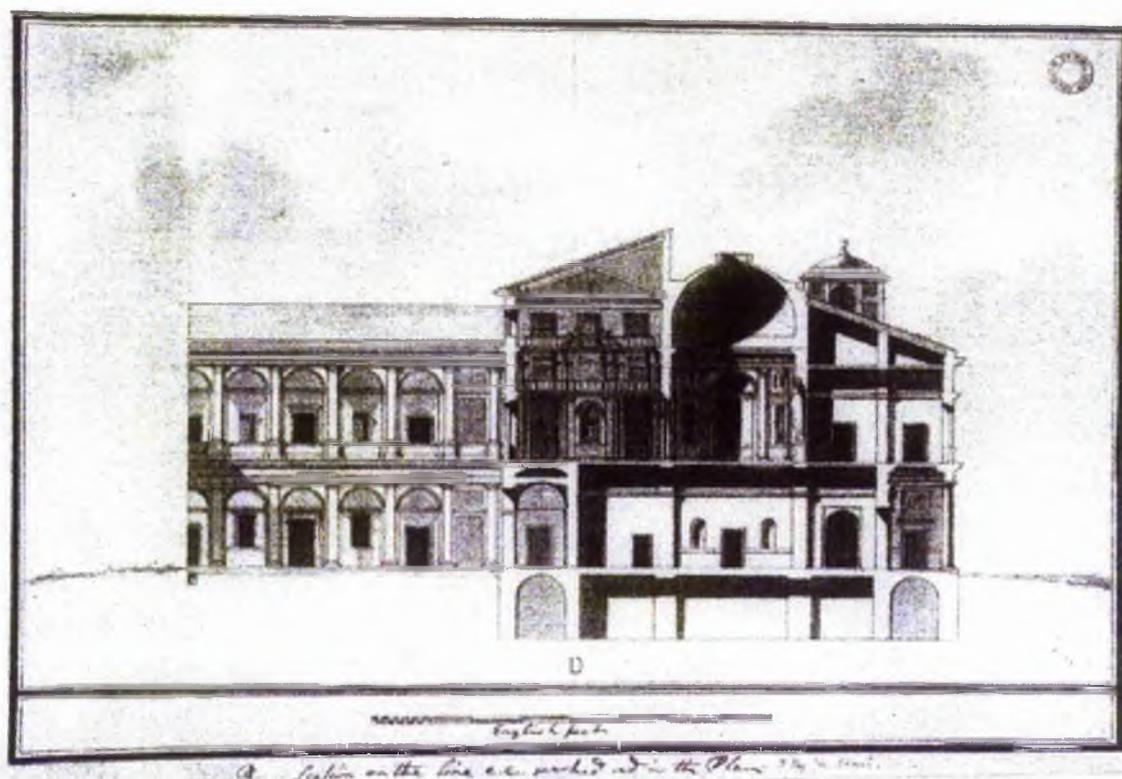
King's College. East-west section and the refronting of Dr Fraser's south wing. J. Byres, 1785.
